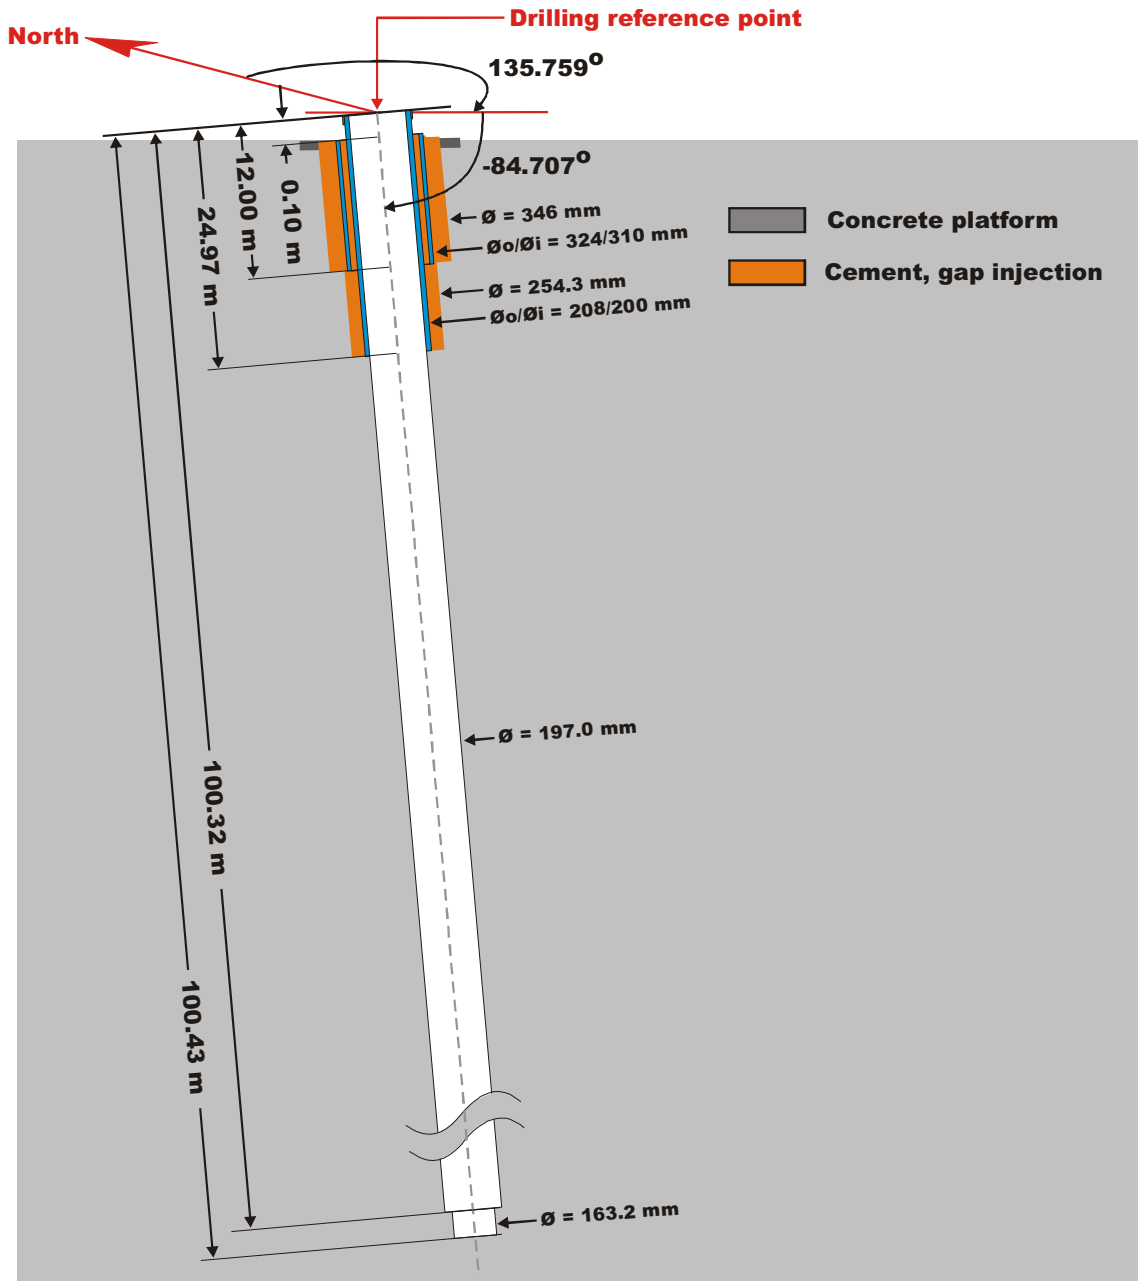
Construction of the telescopic section. The cement for casing grouting is introduced between the casing and the rock wall. The drill bit acts as a barrier so that cement does not enter the pilot hole.
